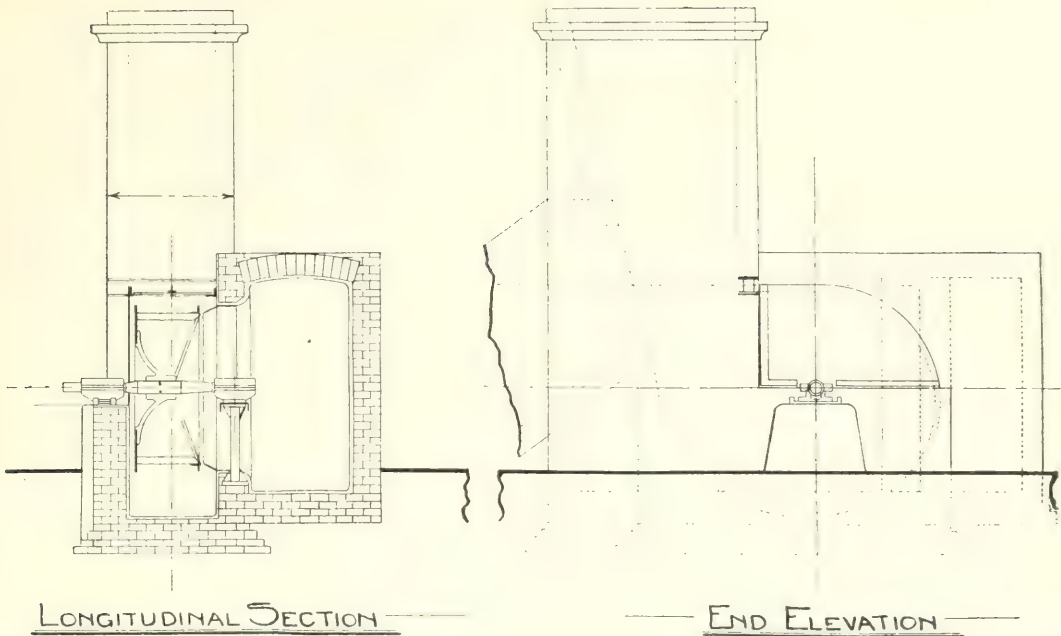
LONGITUDINAL SECTION AND END ELEVATION OF SIROCCO FAN ARRANGED FOR REVERSAL.
